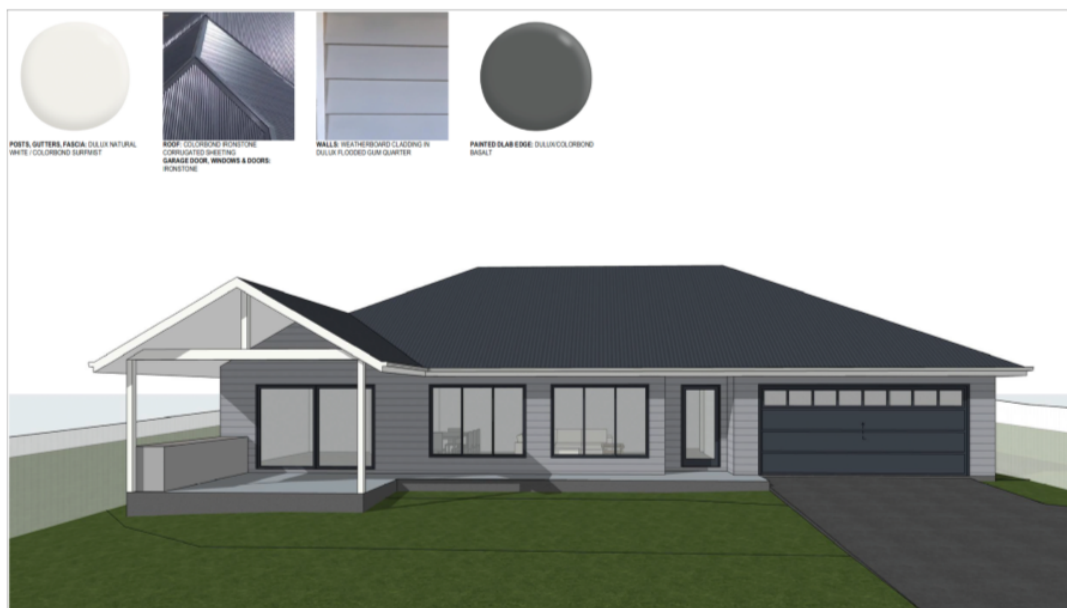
Render of the proposed Lot 2/rear infill development with material palette.
